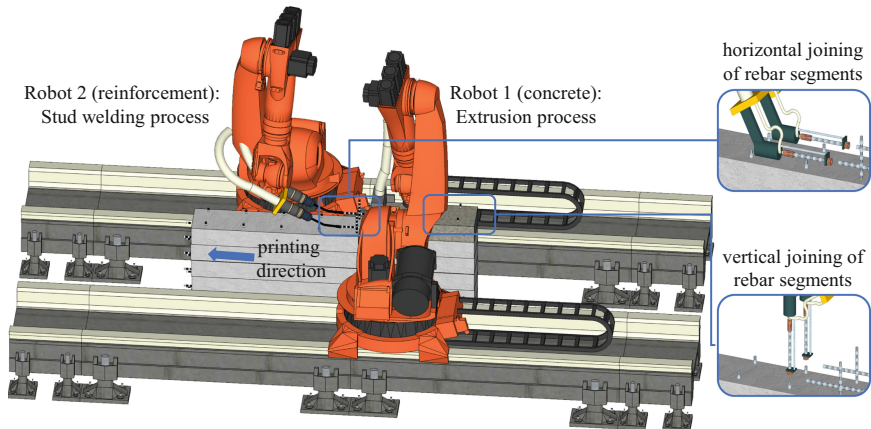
3D printing process (AMoRC) for production of reinforced concrete including concrete extrusion and stud-welding of reinforcement.
